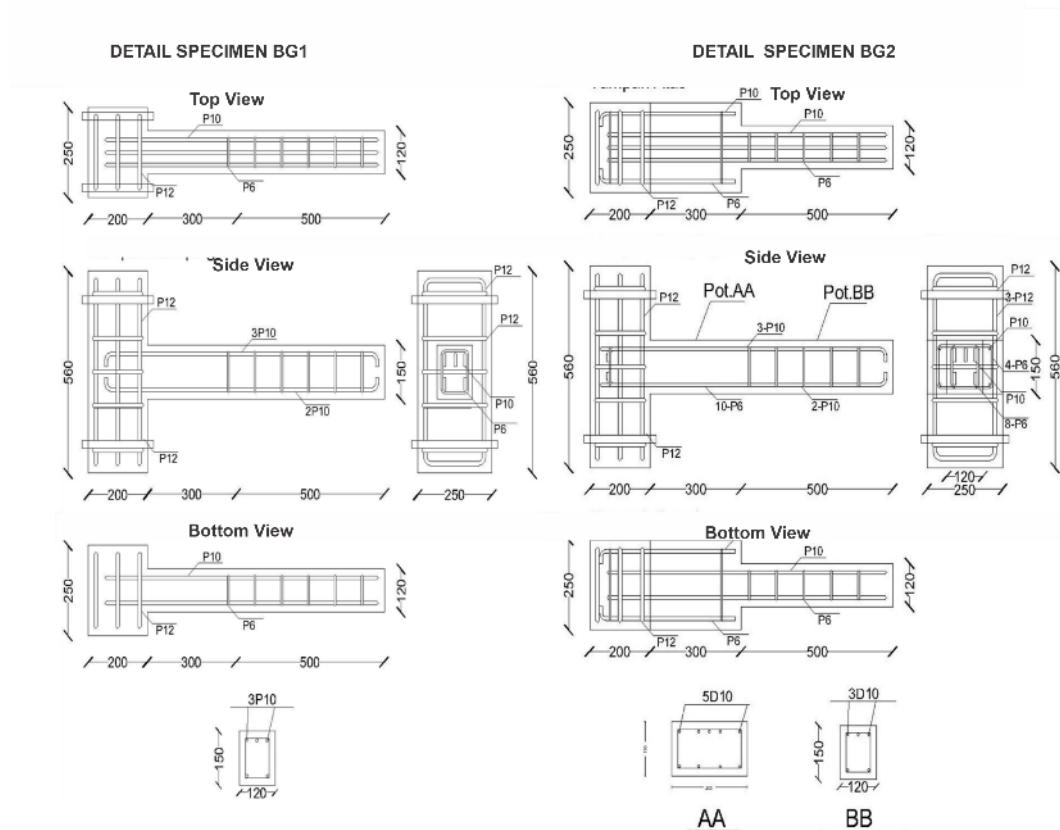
Detail specimens of BG1 and BG2 (units in mm)
